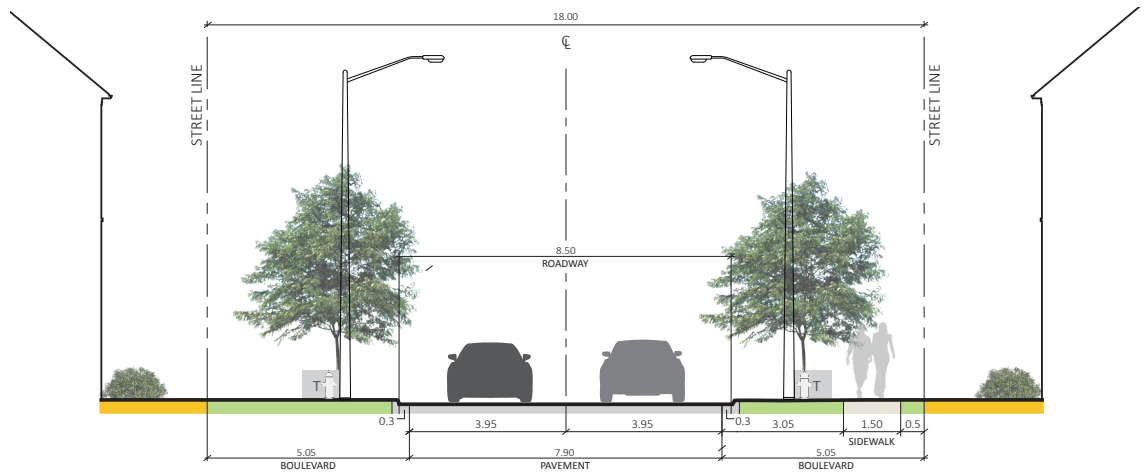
Local Street (18m R.O.W.) Cross-Section
